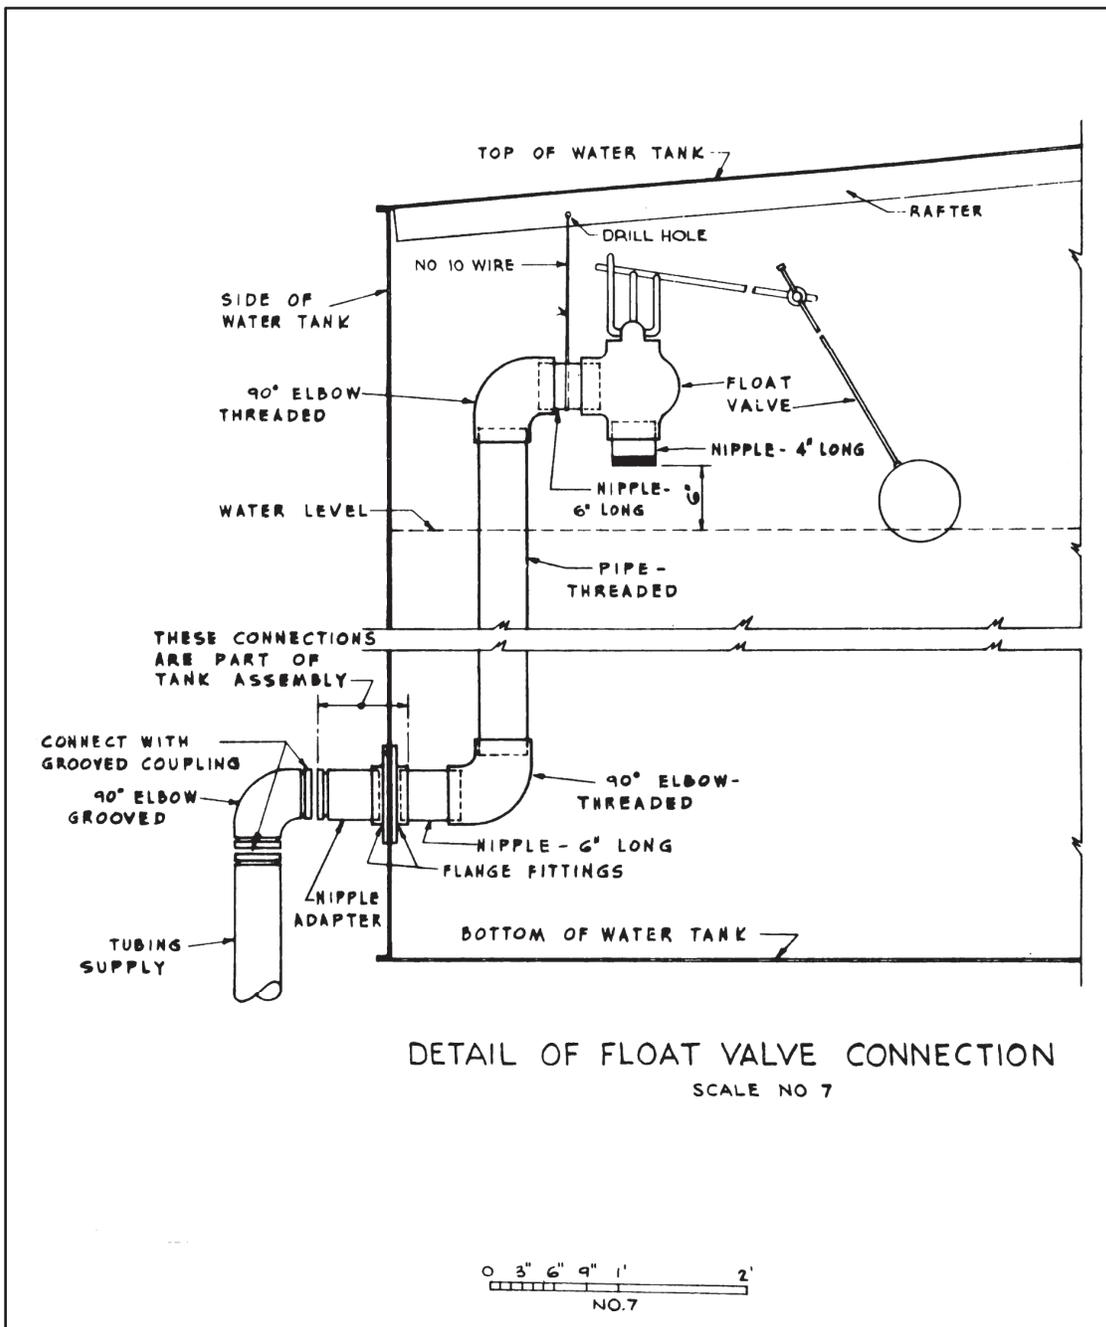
Typical water and tower detail plumbing diagram (continued)
